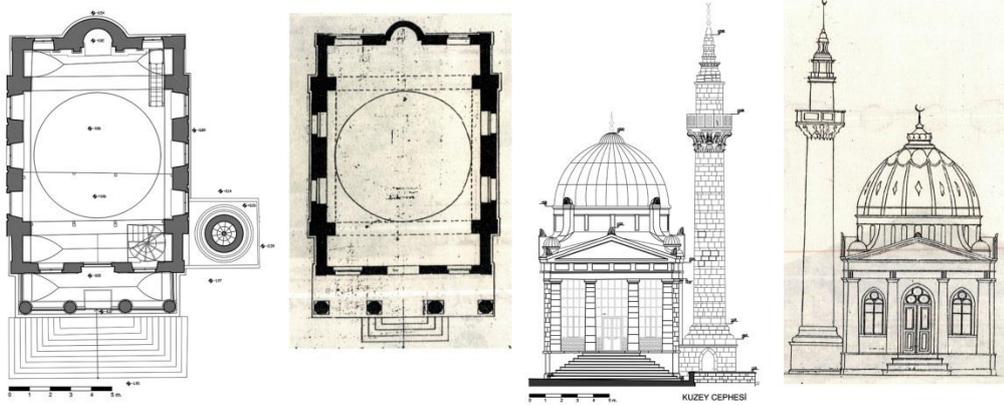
Today's plan – main facade and the proposed 19th century plan –main facade of Ayvalık Hamidiye Mosque.
